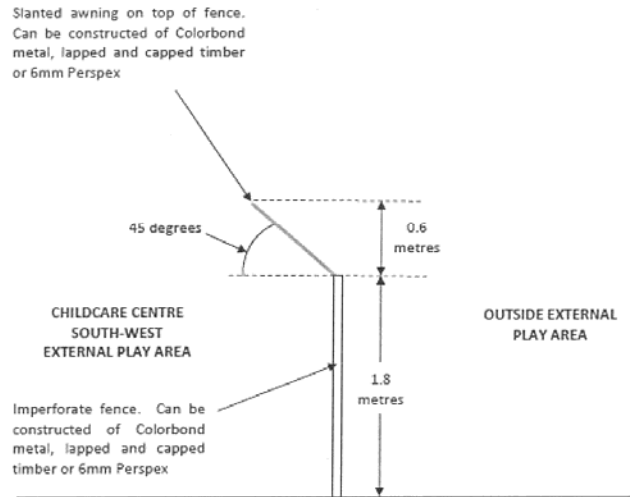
Fencing and lower awning section for parts of outdoor play areas (does not include awning to be extended from façades of building)
